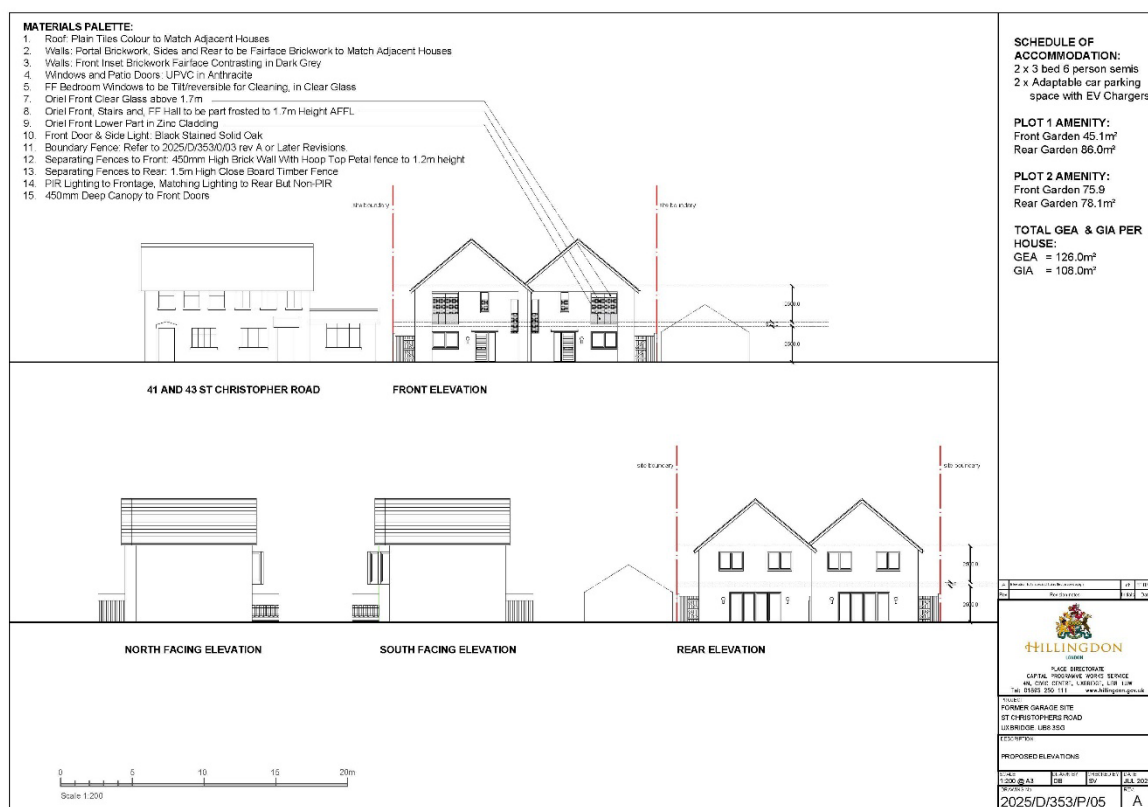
Proposed Elevations Ref:2025/D/353/P05 rev A
